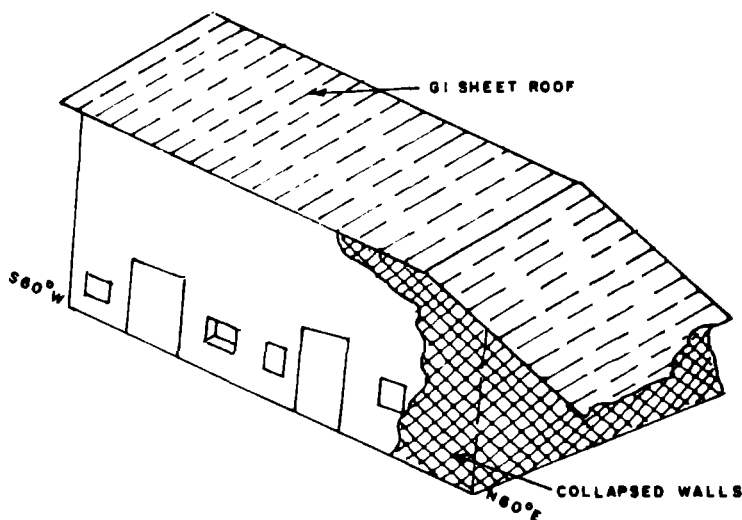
PRIMARY SCHOOL BUILDING, PALA
